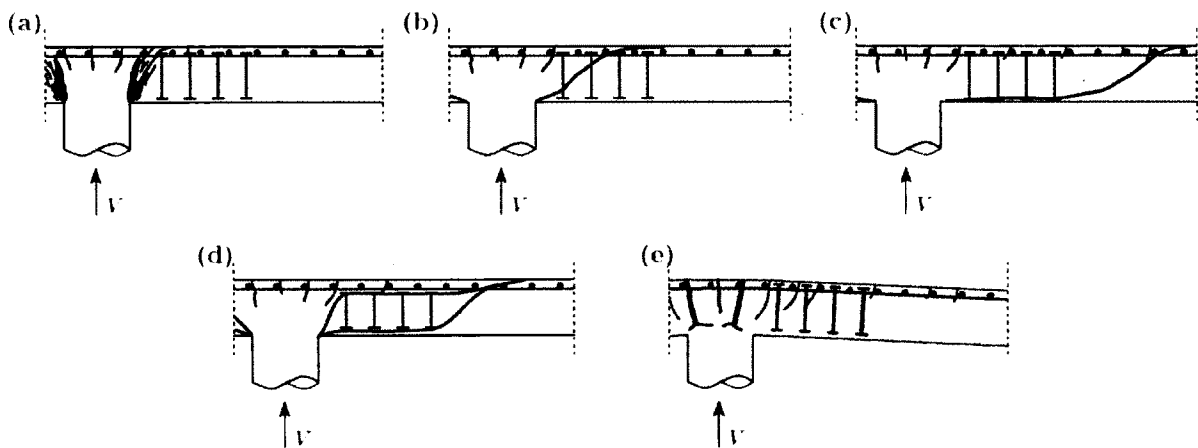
Failure modes in flat slabs: (a) crushing of concrete struts; (b) punching within the shear-reinforced zone; (c) punching outside the shear-reinforced zone; (d) delamination; and (e) flexural yielding (Ruiz and Muttoni 2010).
